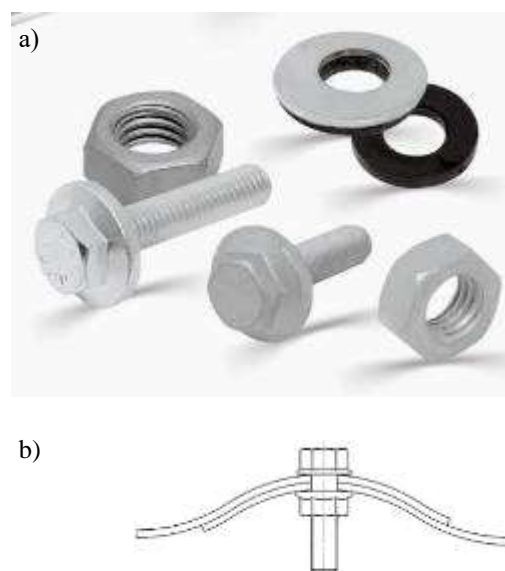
Fasteners (a) and arrangement of bolted joint of the corrugated sheets of the silo body (b)
